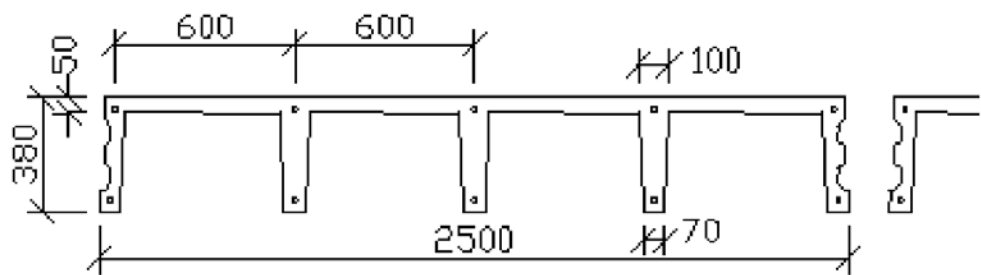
Longitudinal cross-section of precast segments. Longitudinal ribs are 50 mm-wide only at bottom. Lengths in mm (Toutlemonde et al., 2007).
